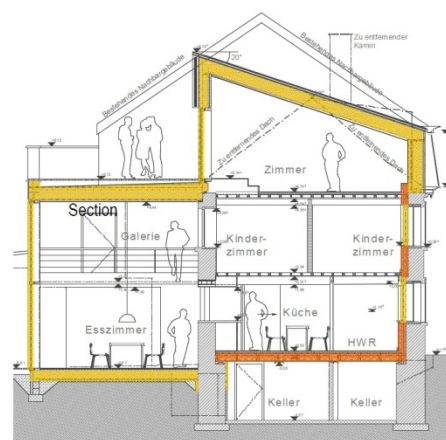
Rowhouse Henz-Noirfalise - Section after retrofit
